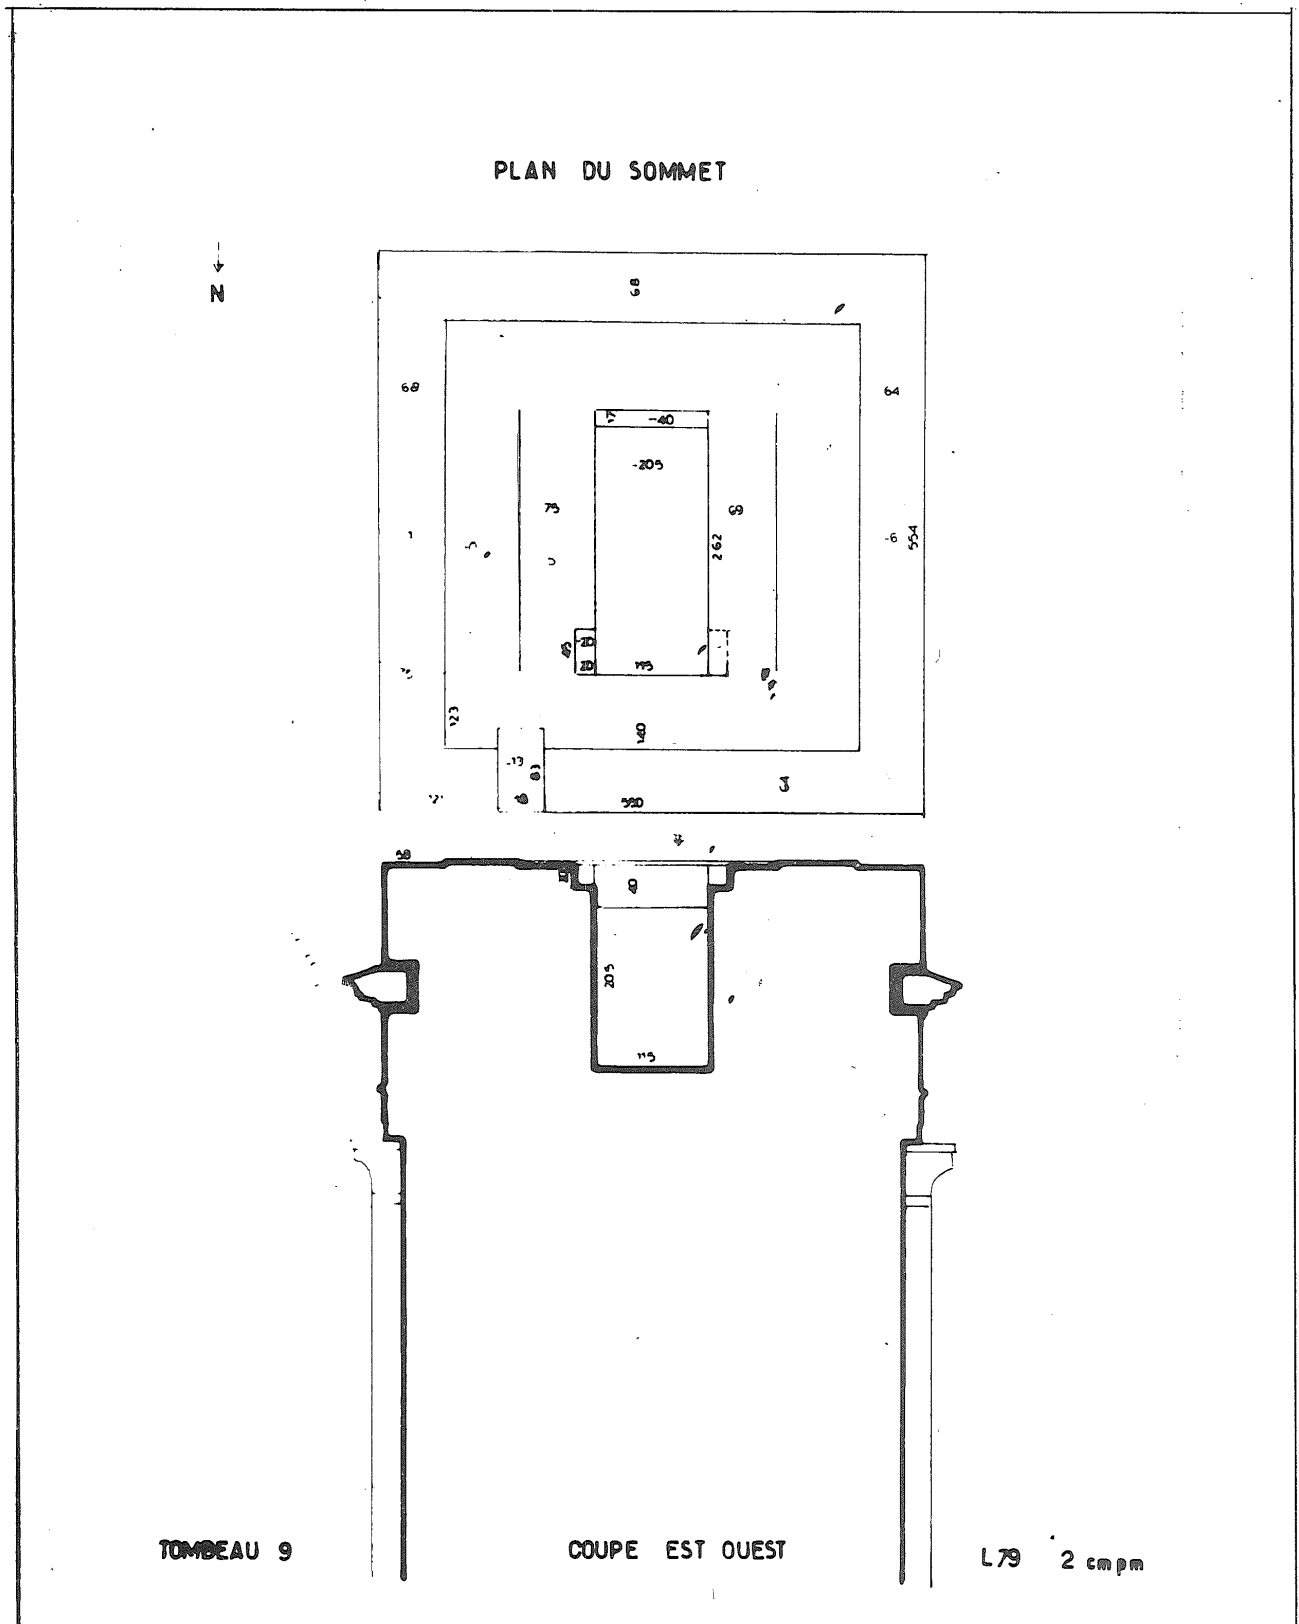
Tomb 9, top plan and E-W. section (by Fr. Larché)
